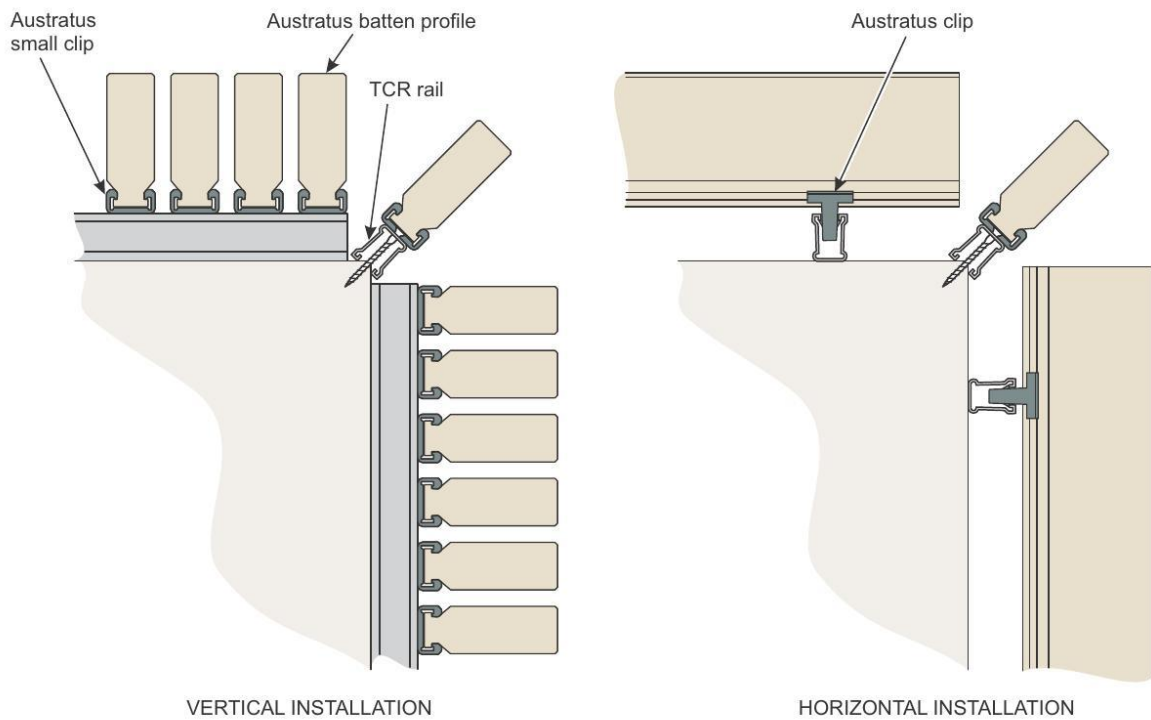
Corner installation: vertical and horizontal profile orientations
